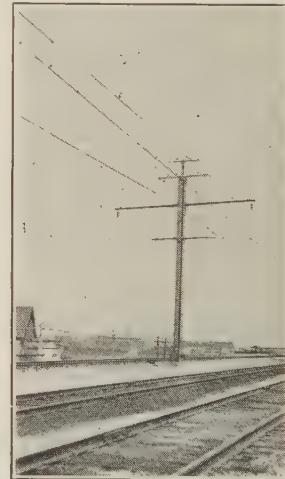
TYPICAL 2-TRACK BRACKET CONSTRUCTION
